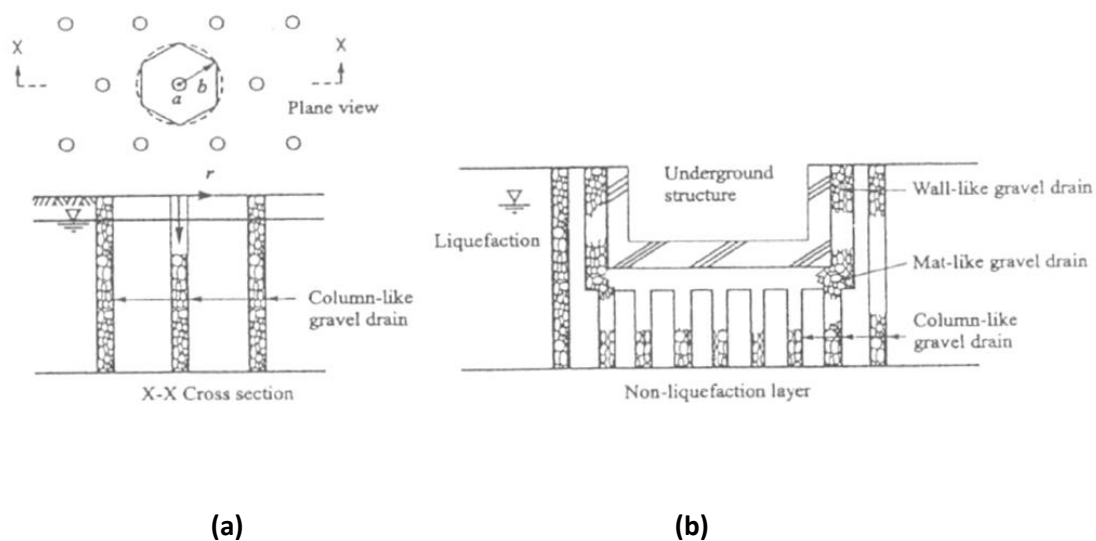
Example of installation of gravel drains (a) in single columns and (b) wall – shaped drain surrounding an underground structure (JGS, 1998).
